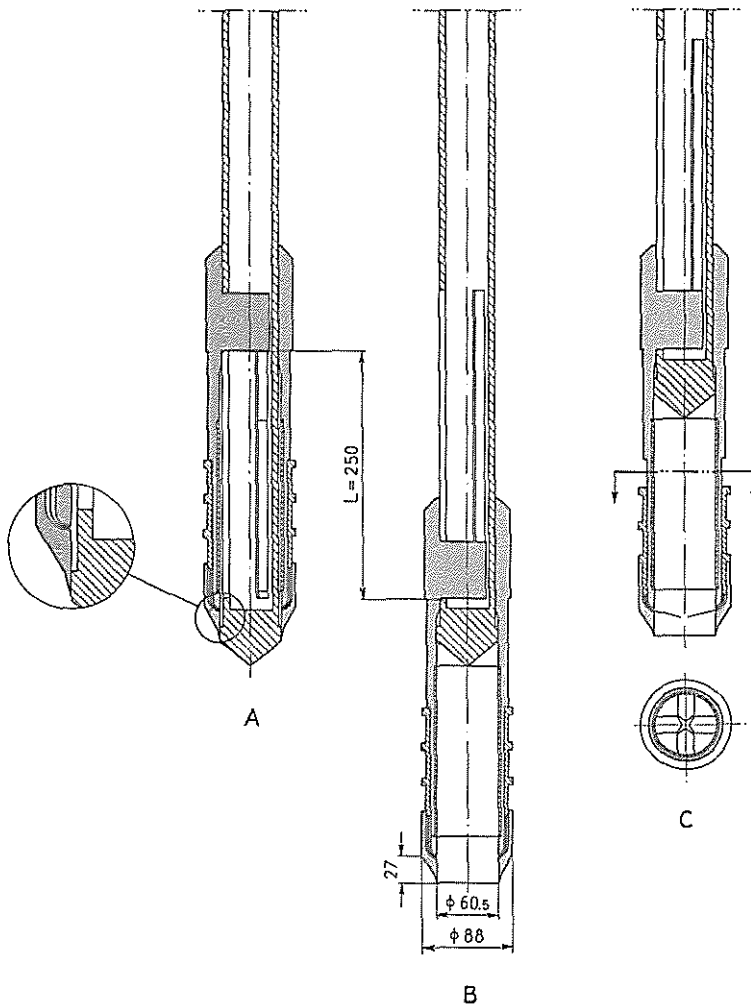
Schematic drawing of early piston sampler with delayed shutter.
